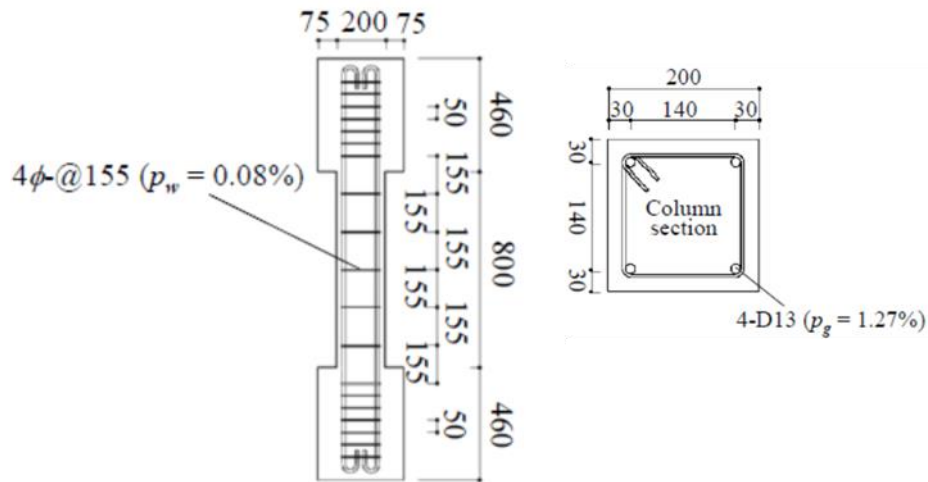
Detail of column specimen (Wen and Oh-Sung, 2014)
